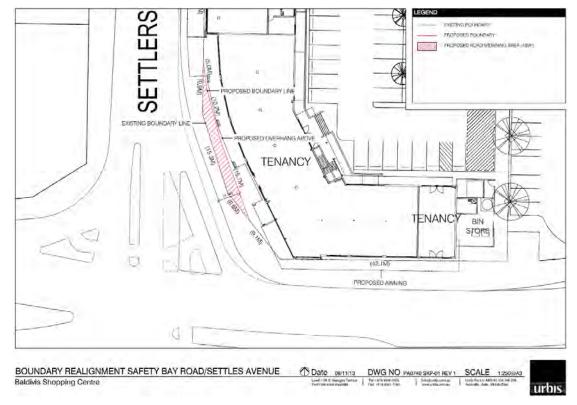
Boundary Realignment Safety Bay Road/Settlers Avenue
